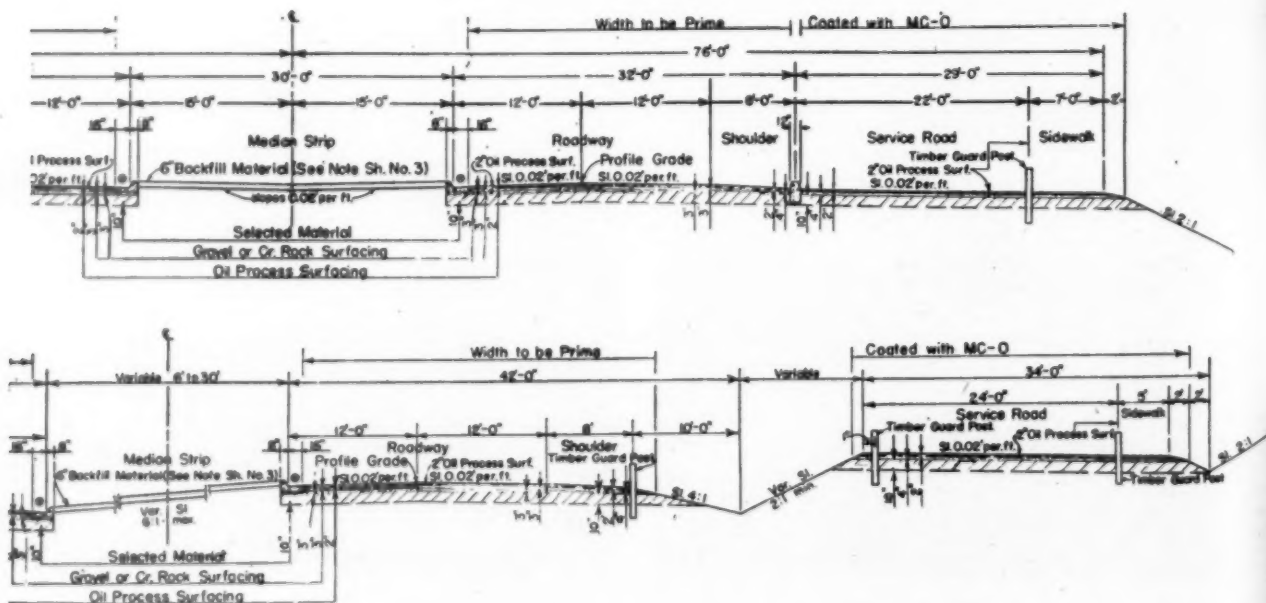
Typical rural cross sections of Denver Ordnance Plant access road
